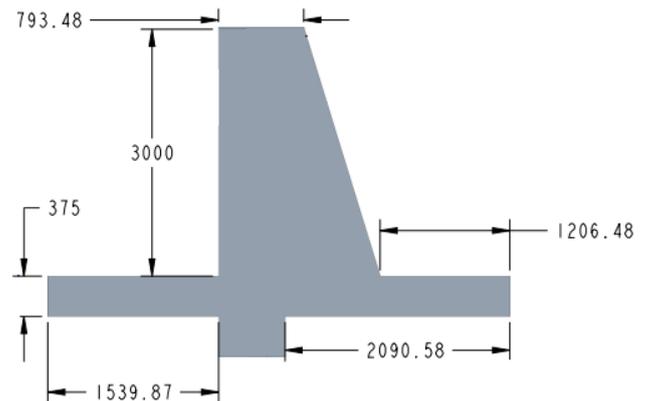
Model of Normal Retaining wall with Dimensions in mm
